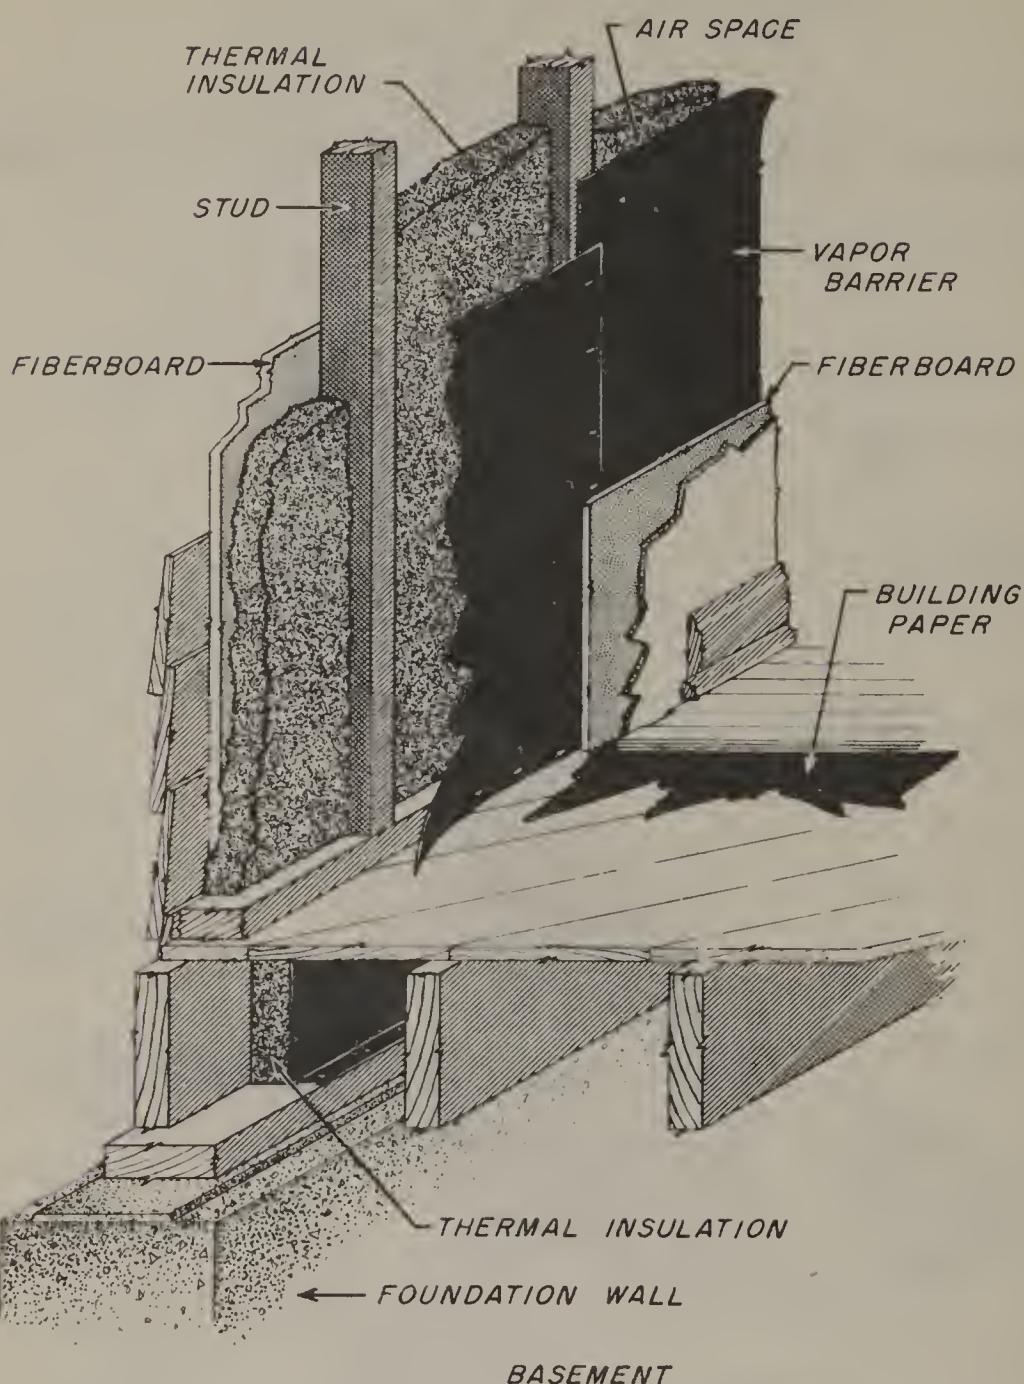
Side wall, first-floor level* Condensation control in this detail consists of a vapor barrier placed over the inside face of the studs running vertically through the full story height and lapping only over studs. A vapor barrier is also shown in the floor section over the foundation wall. Thermal insulation of the batt type and fiberboard lath and sheathing are shown. The insulation is shown wedged between the studs and against the sheathing as is necessary with some types of insulation. Where the batts are enclosed in paper covers for supporting the insulation, it is sometimes installed on the warm side, leaving an air space next to the sheathing. The thermal insulating value is the same whether the insulation is on the warm or cold side of the wall. The advantage of warm-side installation is that accumulations of water inadvertently entering the wall will be dispersed more readily than if the insulation is against the sheathing boards. Well-installed, high-quality vapor barriers will minimize the possibility of water vapor entering the wall in appreciable quantities. A vapor barrier is considered even more essential when the insulation is against the sheathing.
